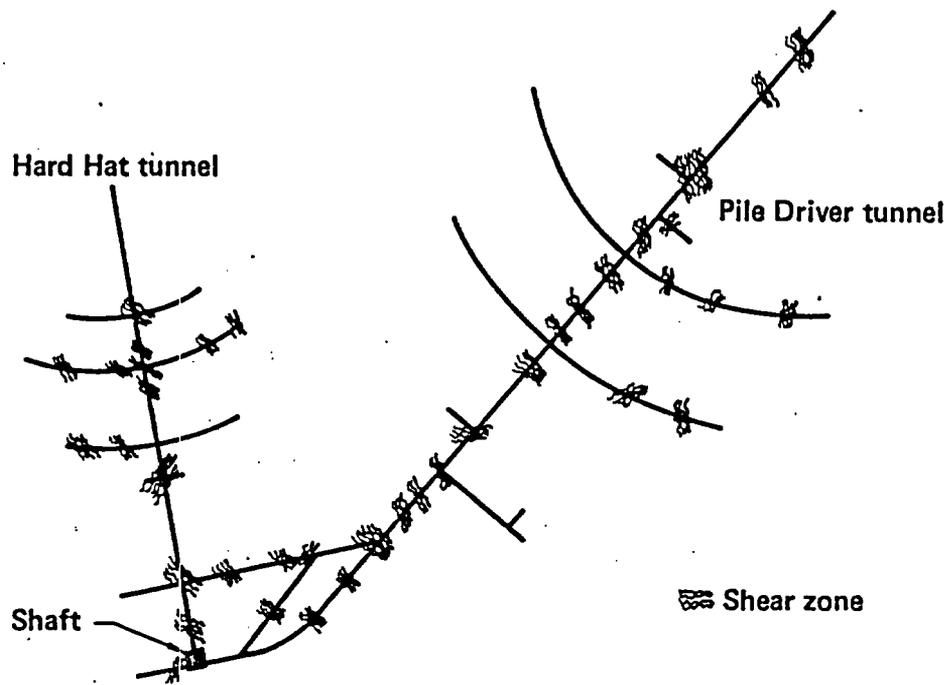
Locations of mapped shear zones in underground workings (plan view).
